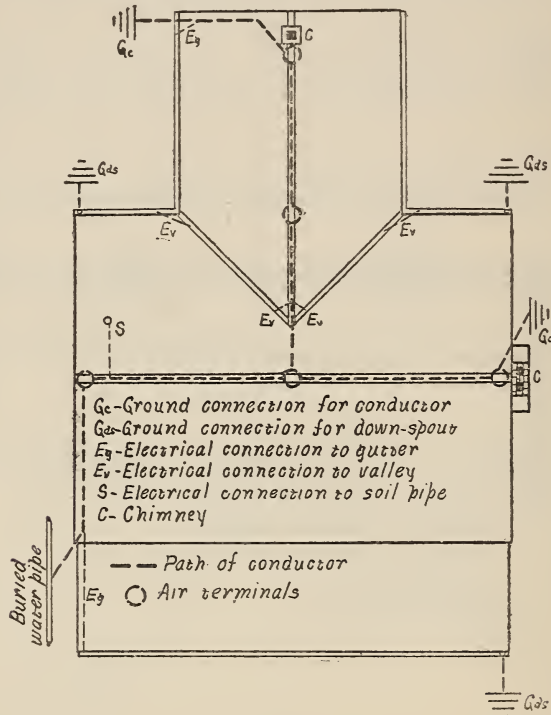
Roof plan of house, showing installation of lightning rods with connections to gutters and valleys and ground connections for down spouts
